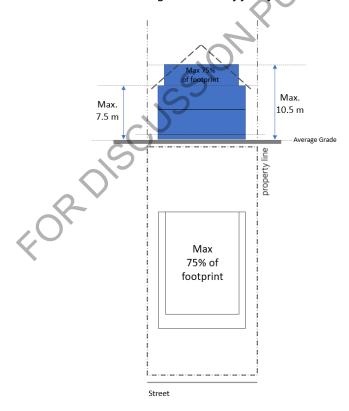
Plan and elevation showing building height and setbacks (above the second floor).
